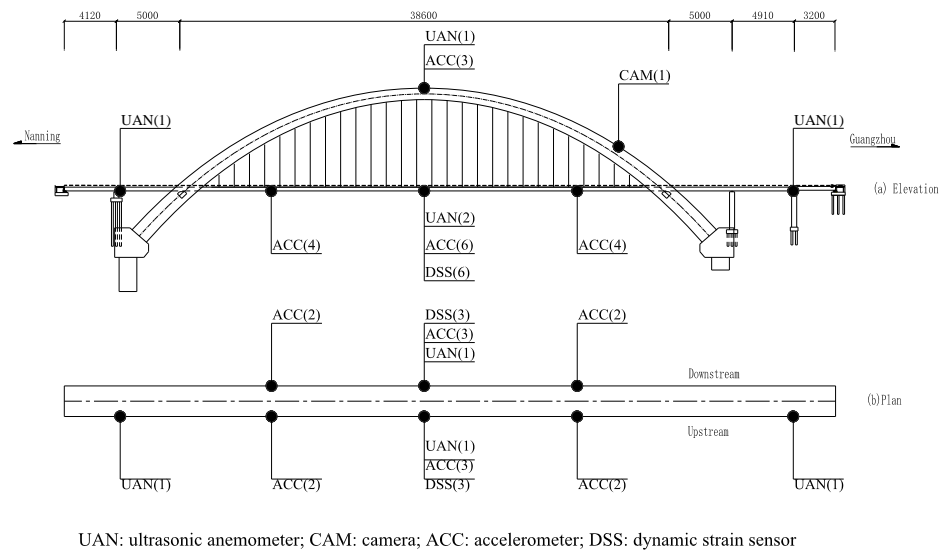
Deployment of sensors on Xijiang bridge (unit: cm)
